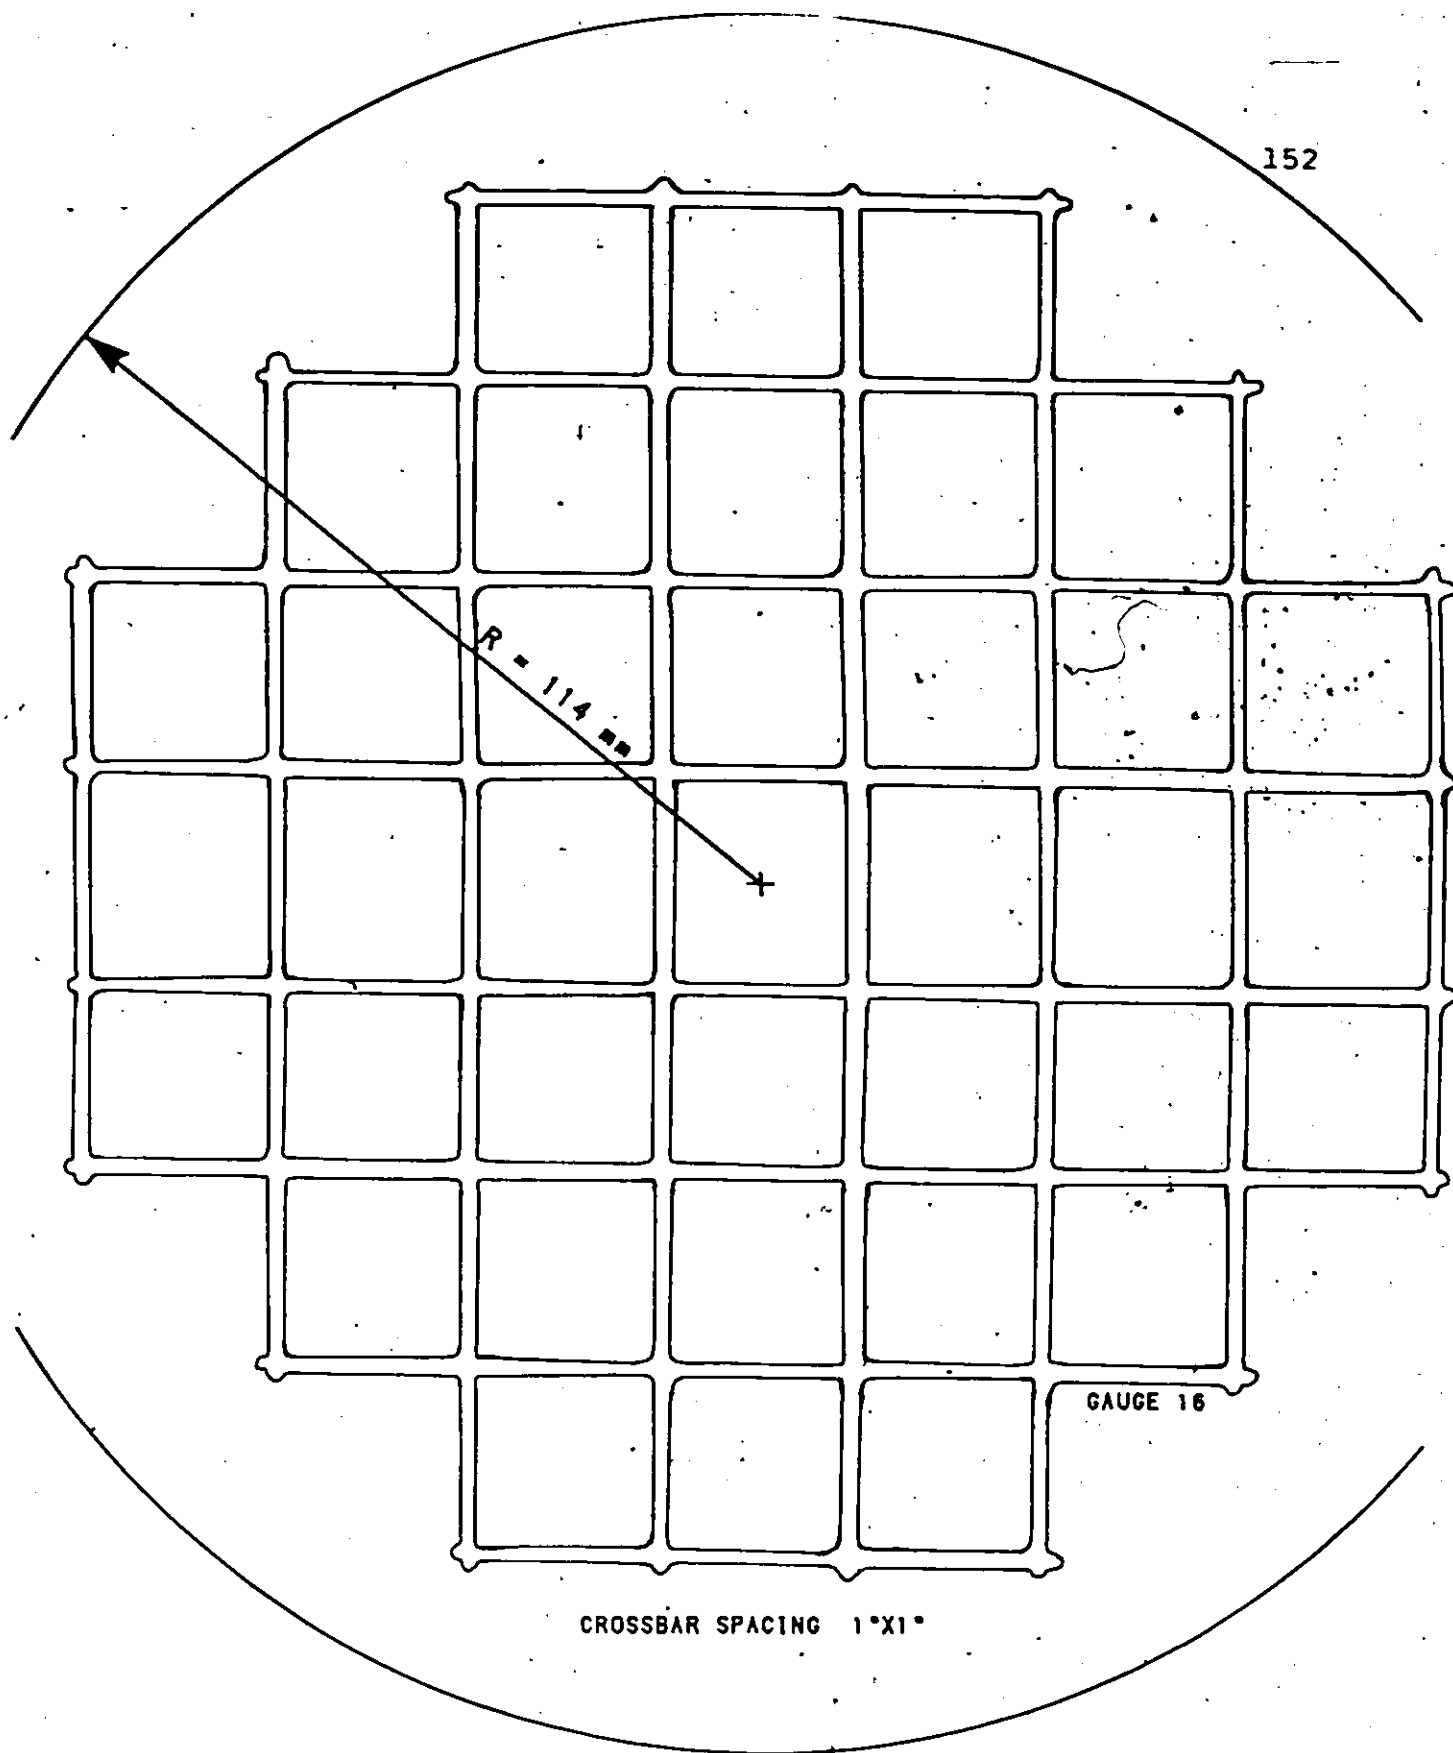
PLAN VIEW OF REINFORCED TRIAXIAL
